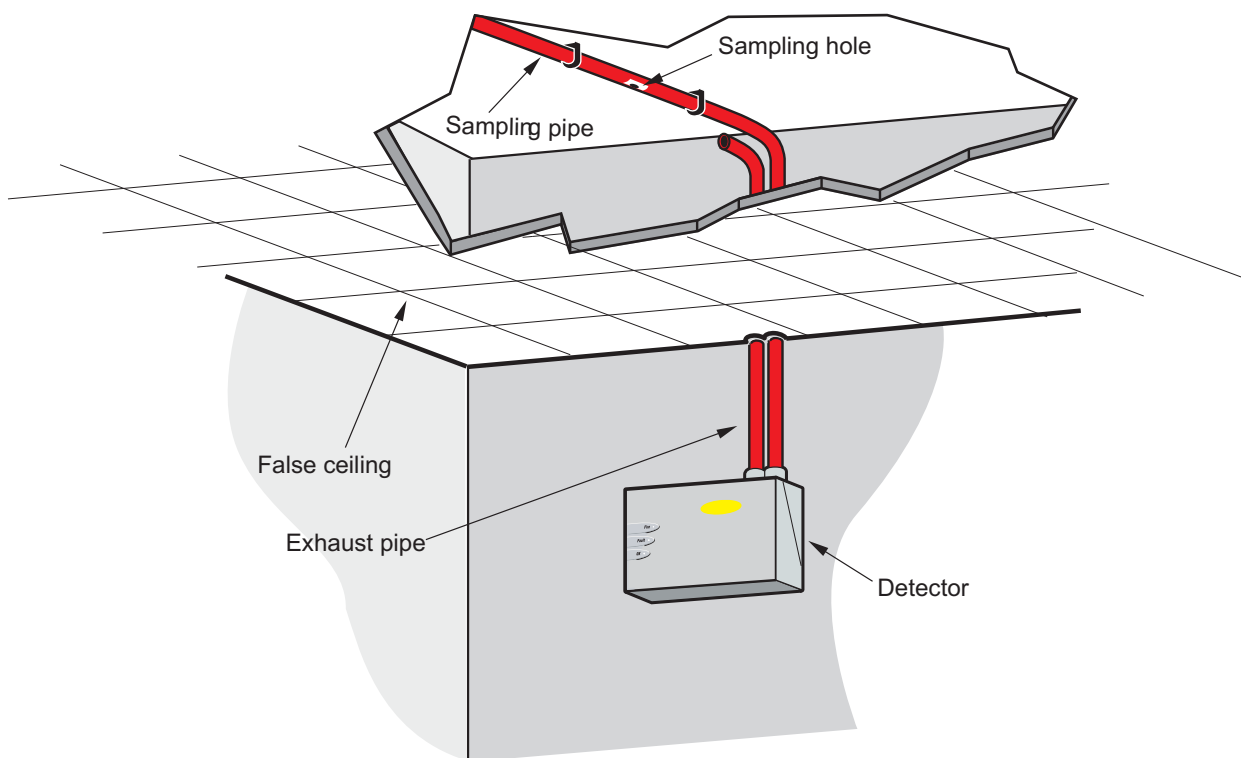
Installation of Pipework Above Ceiling with Exposed Detector (Piped Exhaust)
